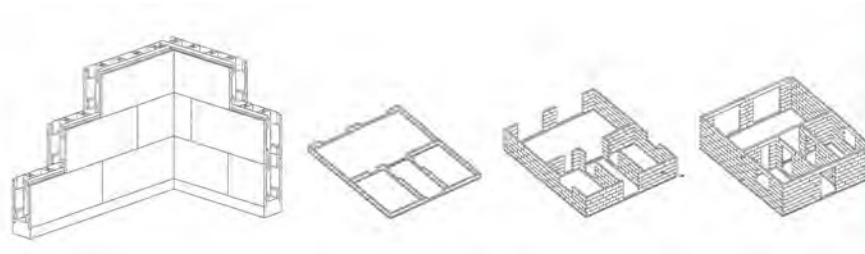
Steko timber module connector system, showing corner connection and the construction process.⁹⁸
